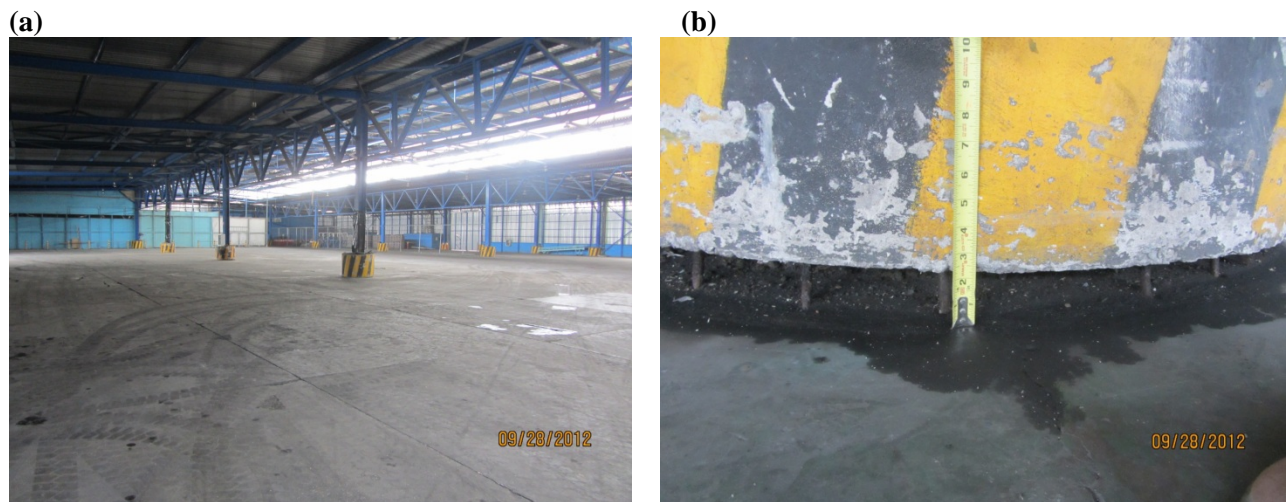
(a) Concrete cylinders protecting pile-supported columns in warehouse adjacent to wharf and (b) earthquake induced settlement of the ground around the column relative to the pile-supported column. (9.91192° N 84.72003° W
